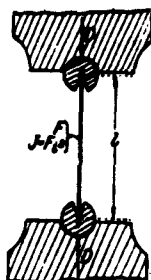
Diagram of a Rod under Compression with Hinged Bearings
